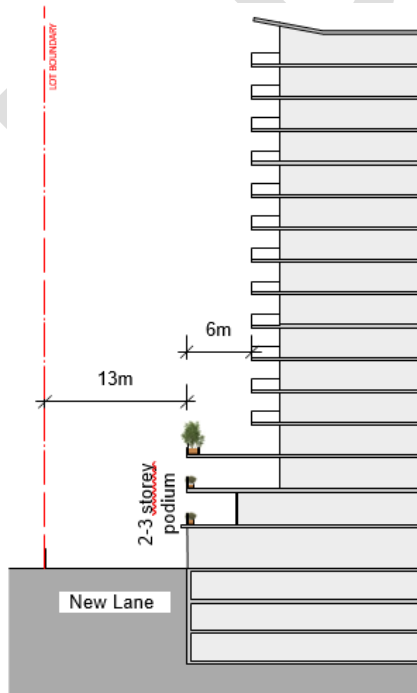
Setbacks to New Lane connecting Carlingford Road and Rawson Street
